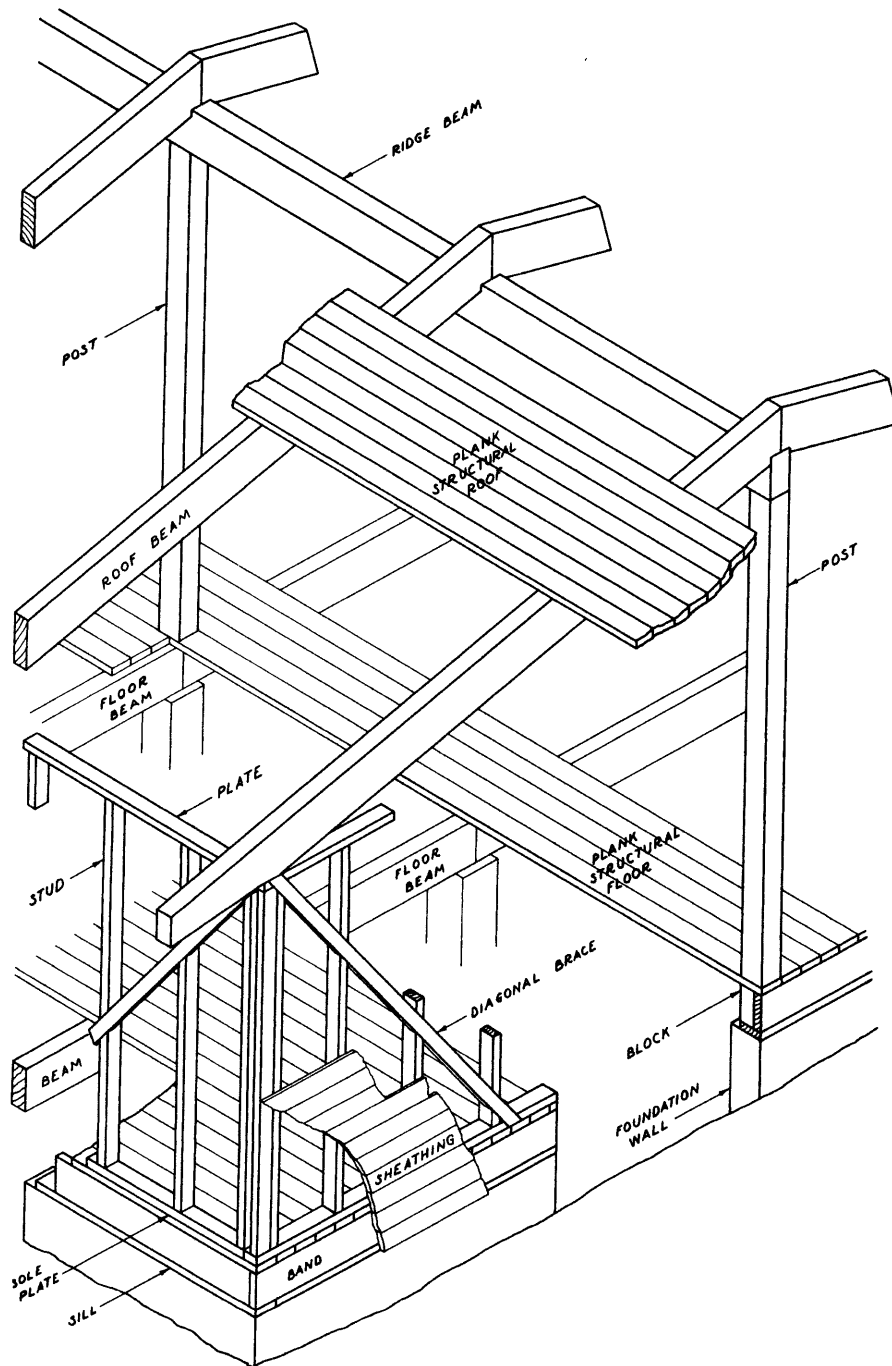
Plank-and-beam framing for one-story house. (Courtesy of American Forest and Paper Association)
